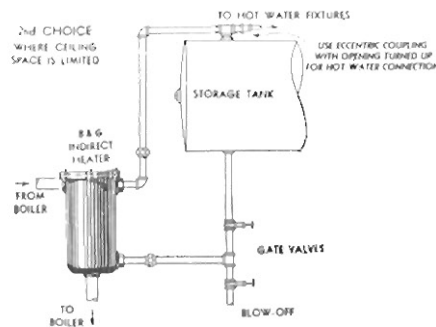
Recommended where ceiling space is limited. The eccentric coupling at the hot water outlet assures removal of air from heater line.
